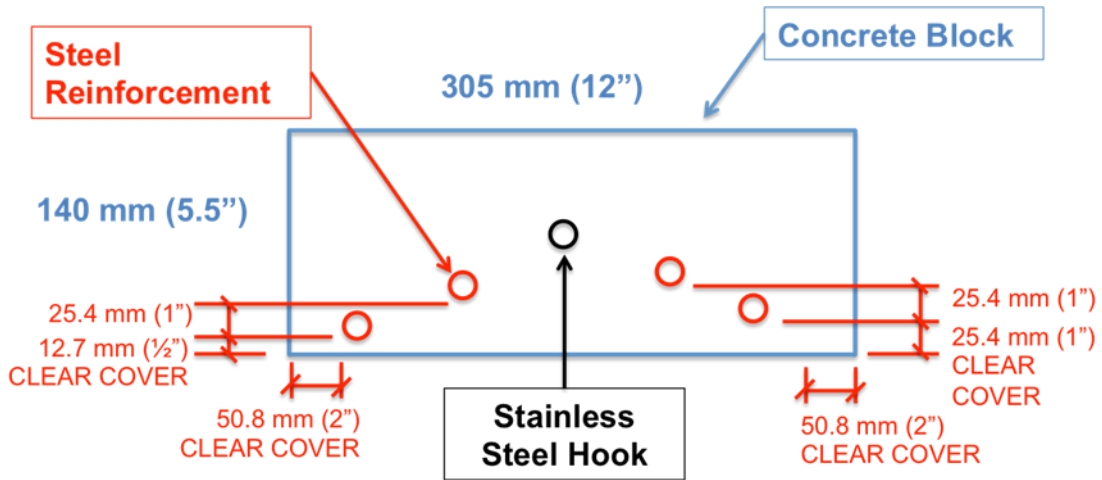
Cross-Sectional View of Reinforced Concrete Block used to Monitor Corrosion Potential
